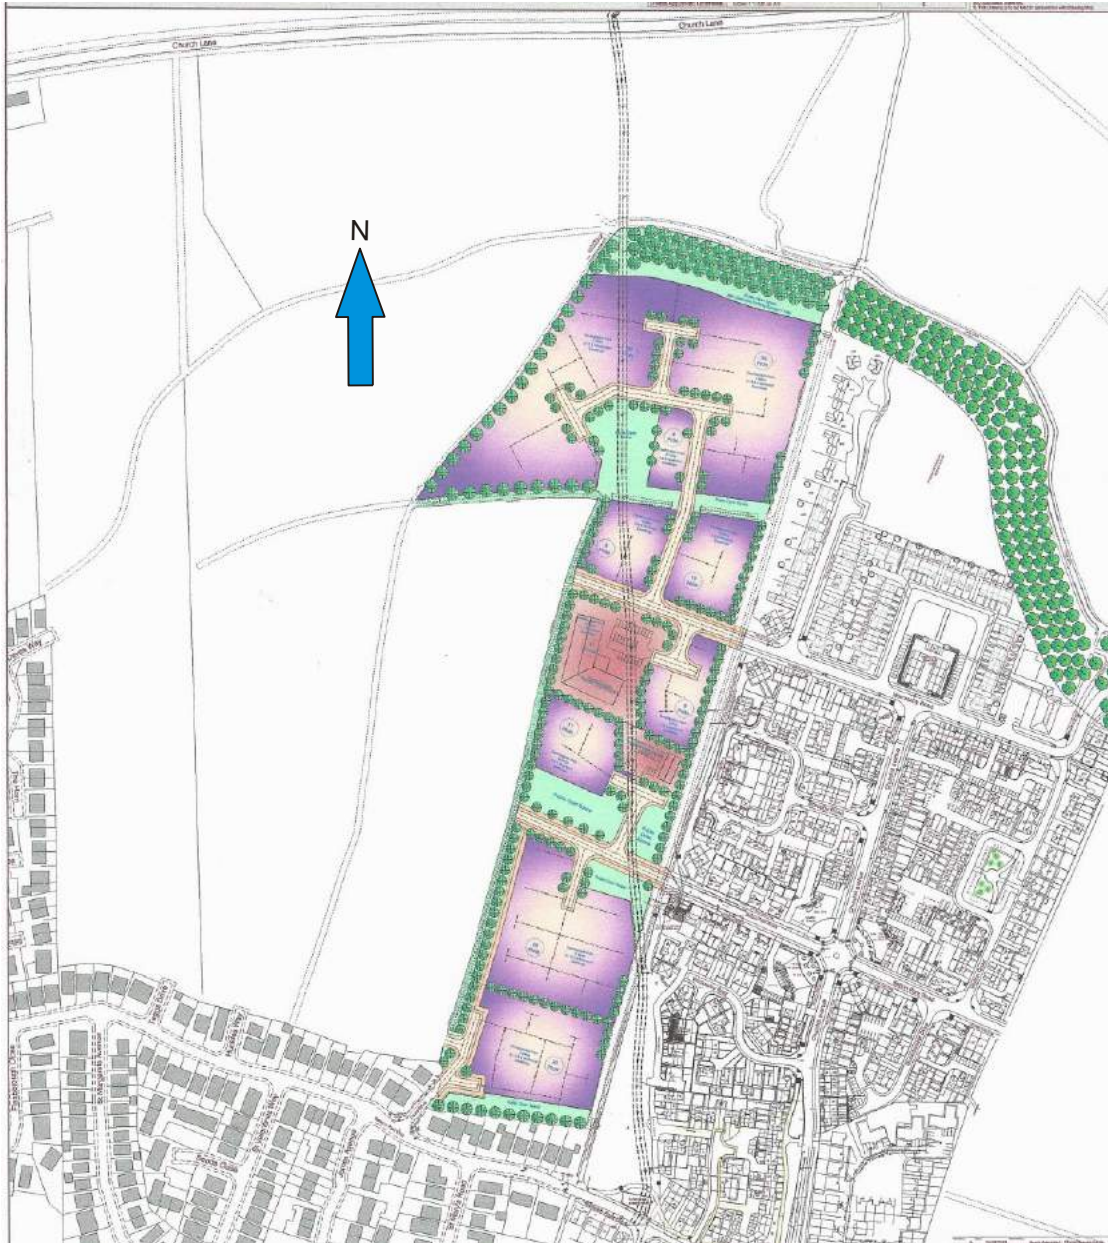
Plan showing the proposed indicative layout of the development site at an original scale of 1:1,000 at A0, (extract from Architects plan)
